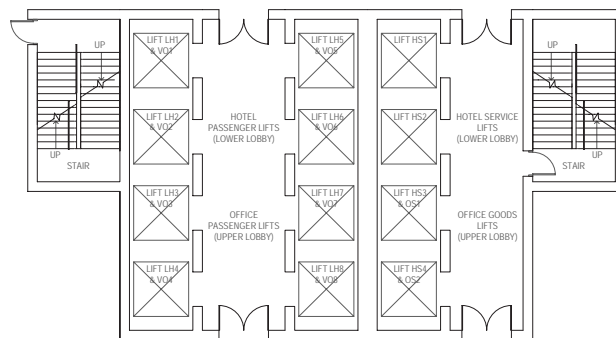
Mixed-Use Tower Elevator Core (Source: Meinhardt Pty Ltd)
